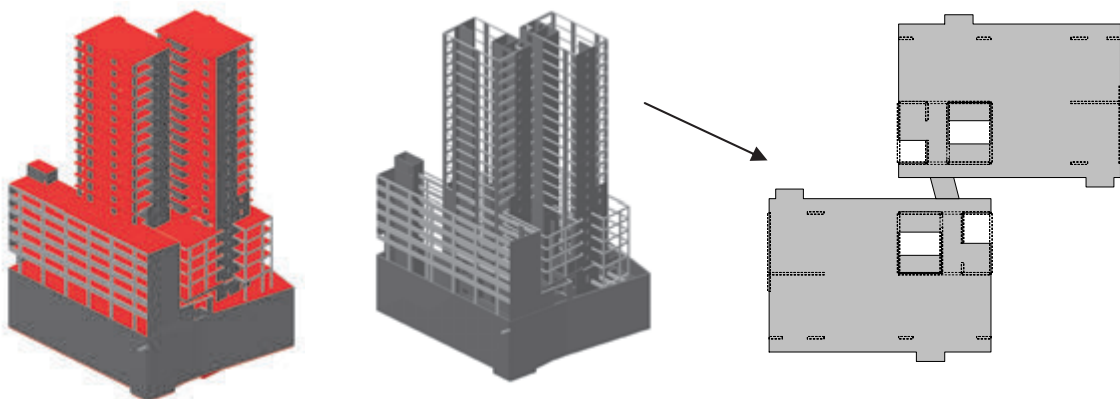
3D numerical model with load-bearing structure elements and typical floor plan
